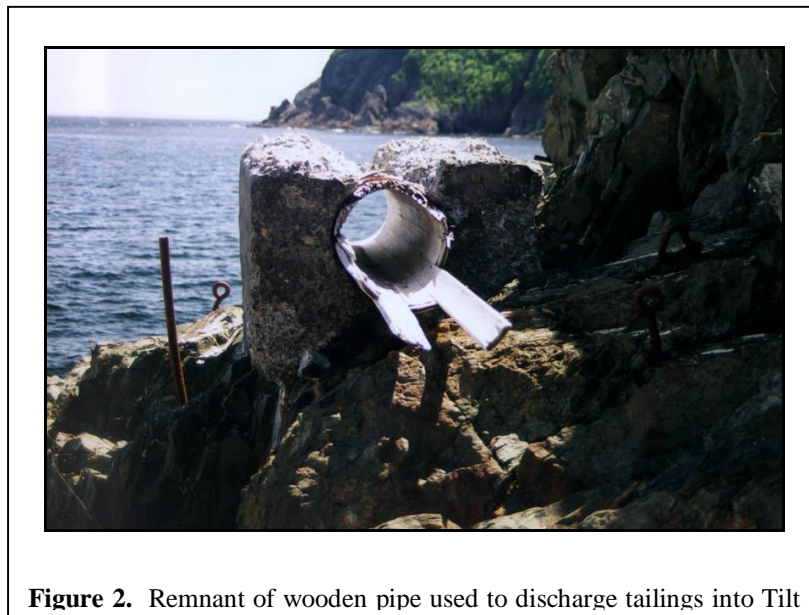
Remnant of wooden pipe used to discharge tailings into Tilt
